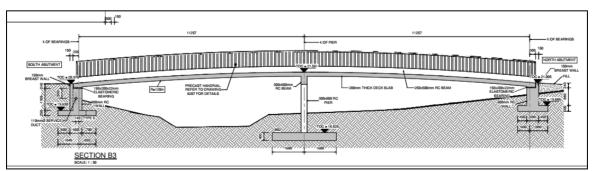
Bridge 2 Cross-Section (source: GIBB, 2021)
